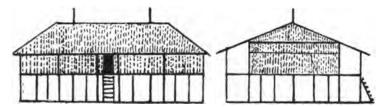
Side and end elevation of Marau's pile dwelling on Mer, by A. W. Scale 16 ft. to 1 in.
